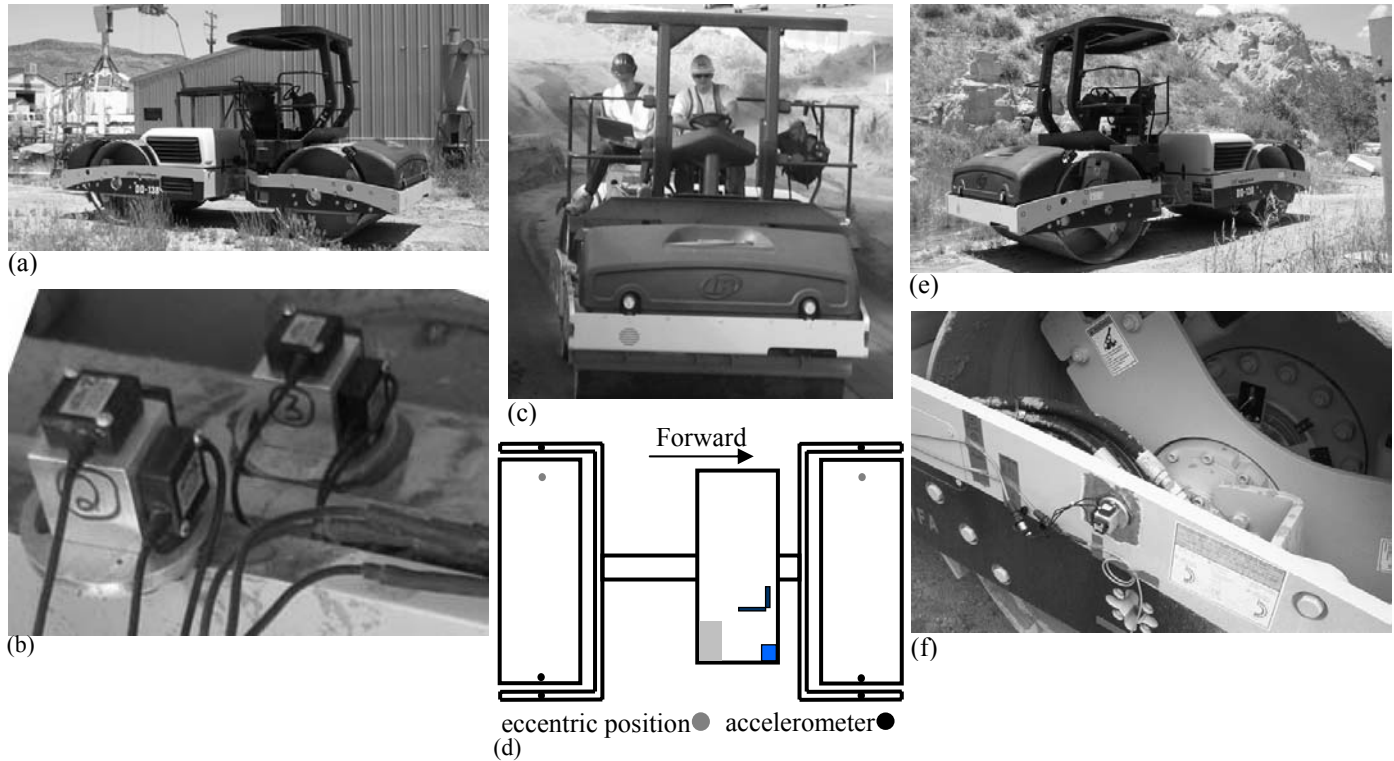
(a) The Ingersoll-Rand DD138HFA roller compactor viewed from the right, (b) the drum and frame accelerometer mounts on the right side of the machine, (c) the roller compactor viewed from the front, (d) a plan view schematic summarizing all sensor locations, (e) the roller compactor viewed from the left, and (f) the frame accelerometer mounts on the left side of the machine, and the hand wheel used to adjust the vibration amplitude and monitor the position of the rotating eccentric mass.
